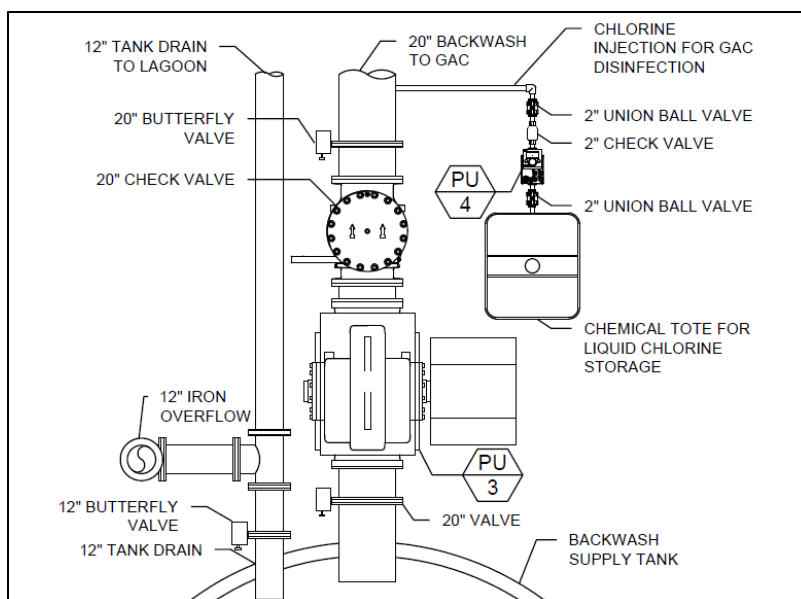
Backwash Supply Outlet From Forefront Consulting Drawing Set Page 19, Appendix 9.6
